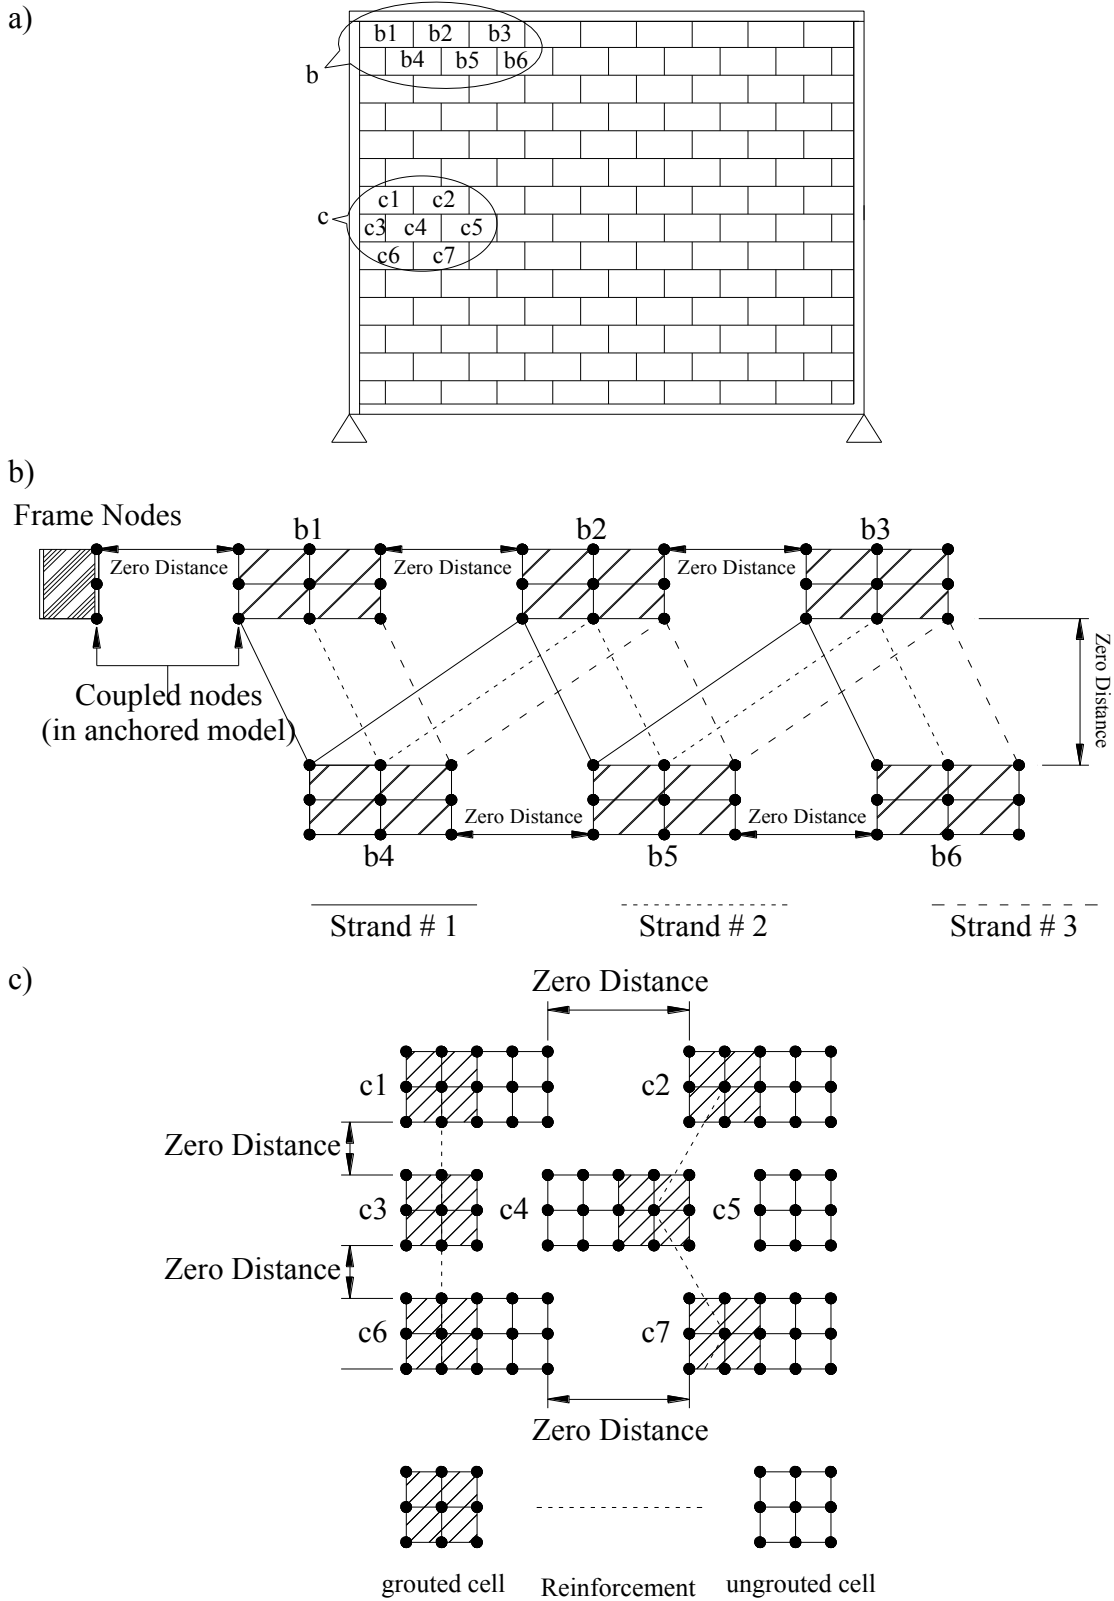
Modeling of reinforcement: a) elevation of the infill b) horizontal joint reinforcement, c) vertical reinforcement
